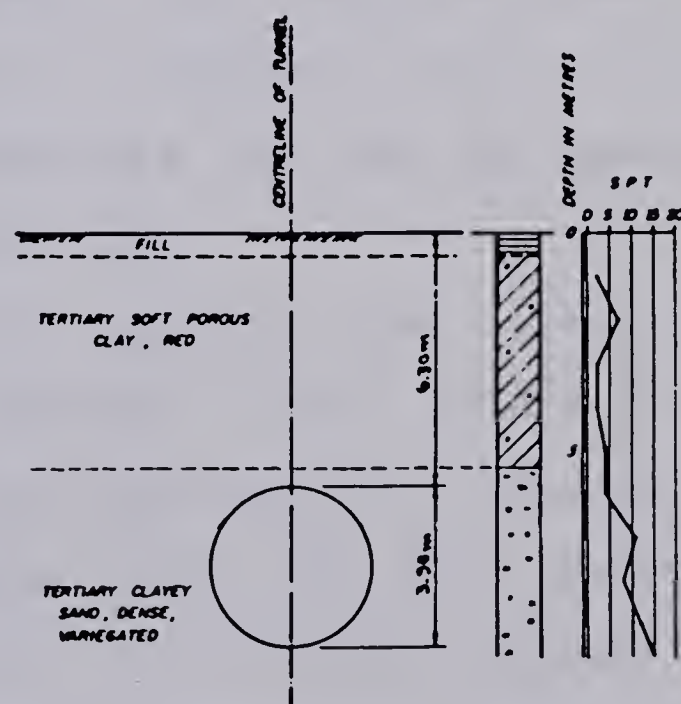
Typical geotechnical profile at ABV site (after Negro and Eisenstein, 1981:modified)
